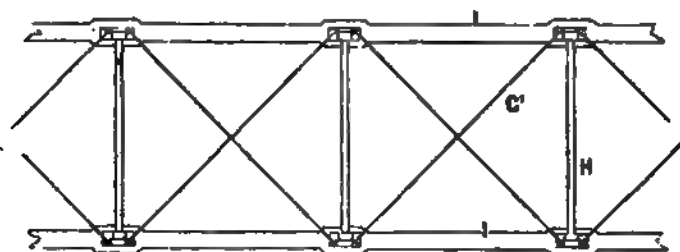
Plan of the top of the bridge. I, top chord. H, cross-tie or strut. G', upper horizontal tie.
